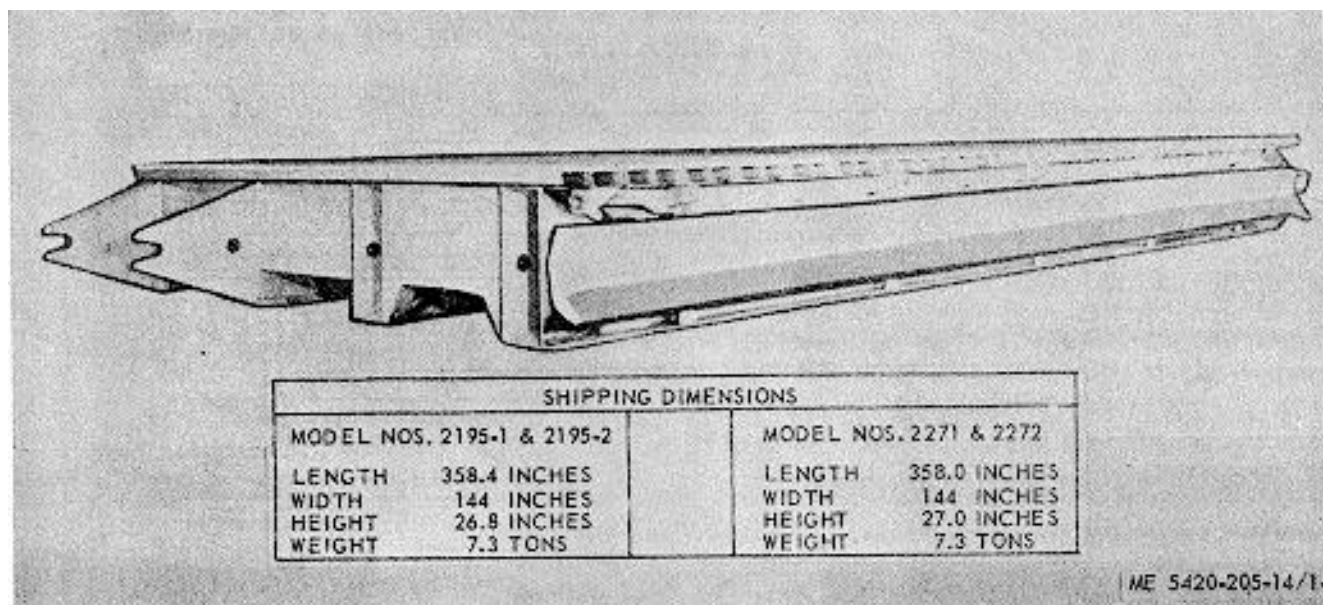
Interior bay superstructure, three-quarter view with shipping dimensions.
